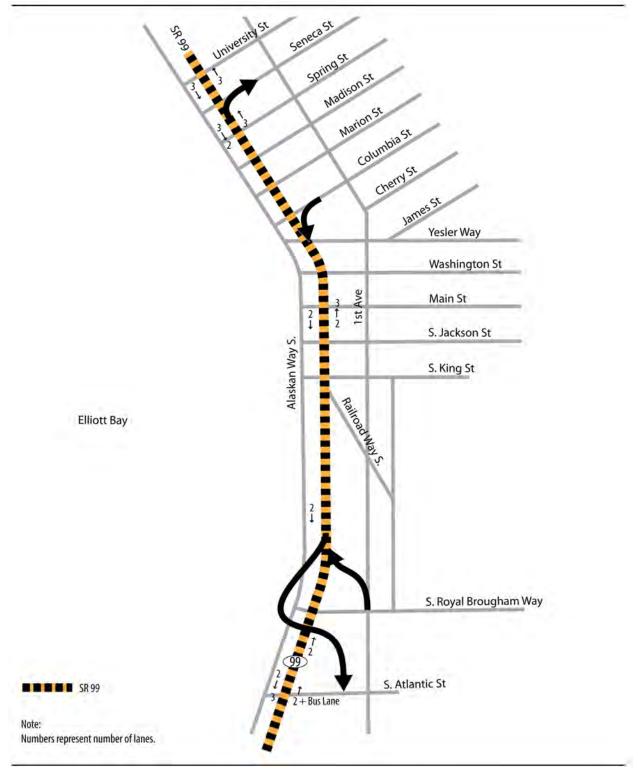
Bored Tunnel Alternative Traffic Stage 5 Roadway Configuration (South)
